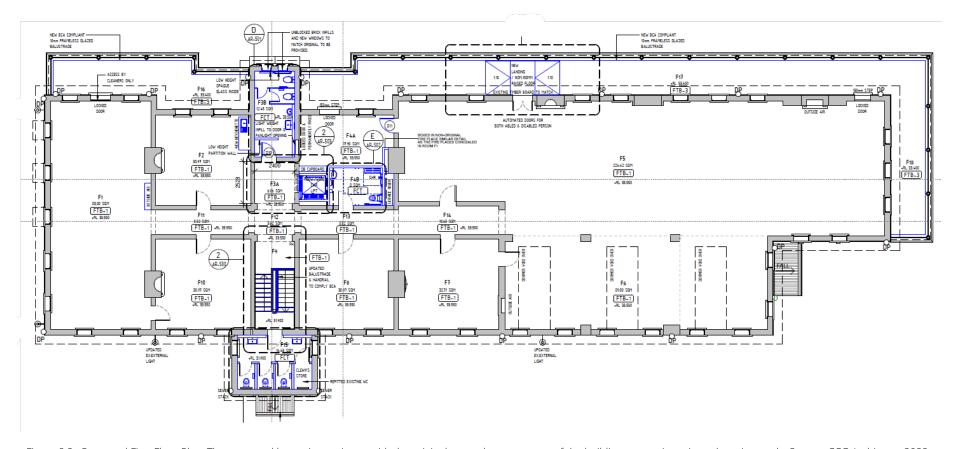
Proposed First Floor Plan. The proposed layout is consistent with the original general arrangement of the building, proposing minor alterations only. Source: CCG Architects, 2022.
